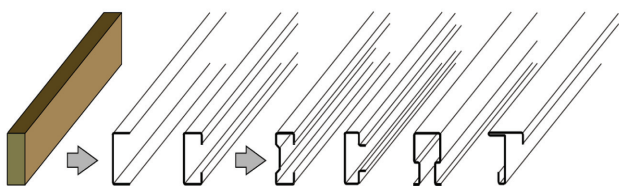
Light-gauge steel shapes as substitutes to wooden member
